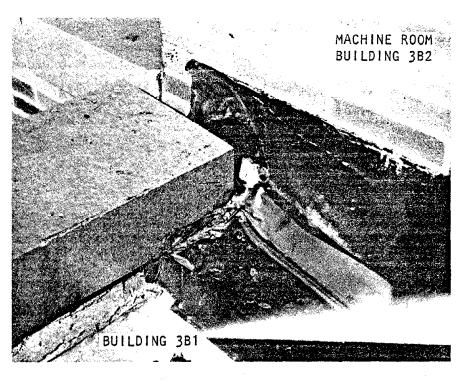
DAMAGE TO FLEXIBLE EXPANSION JOINT AT ROOF LEVEL (See Fig. 3-1a for location)
